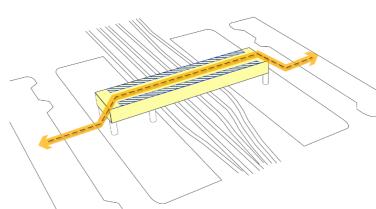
New unpaid connections - integrated wit new buildings, with FOB having vendor spaces
